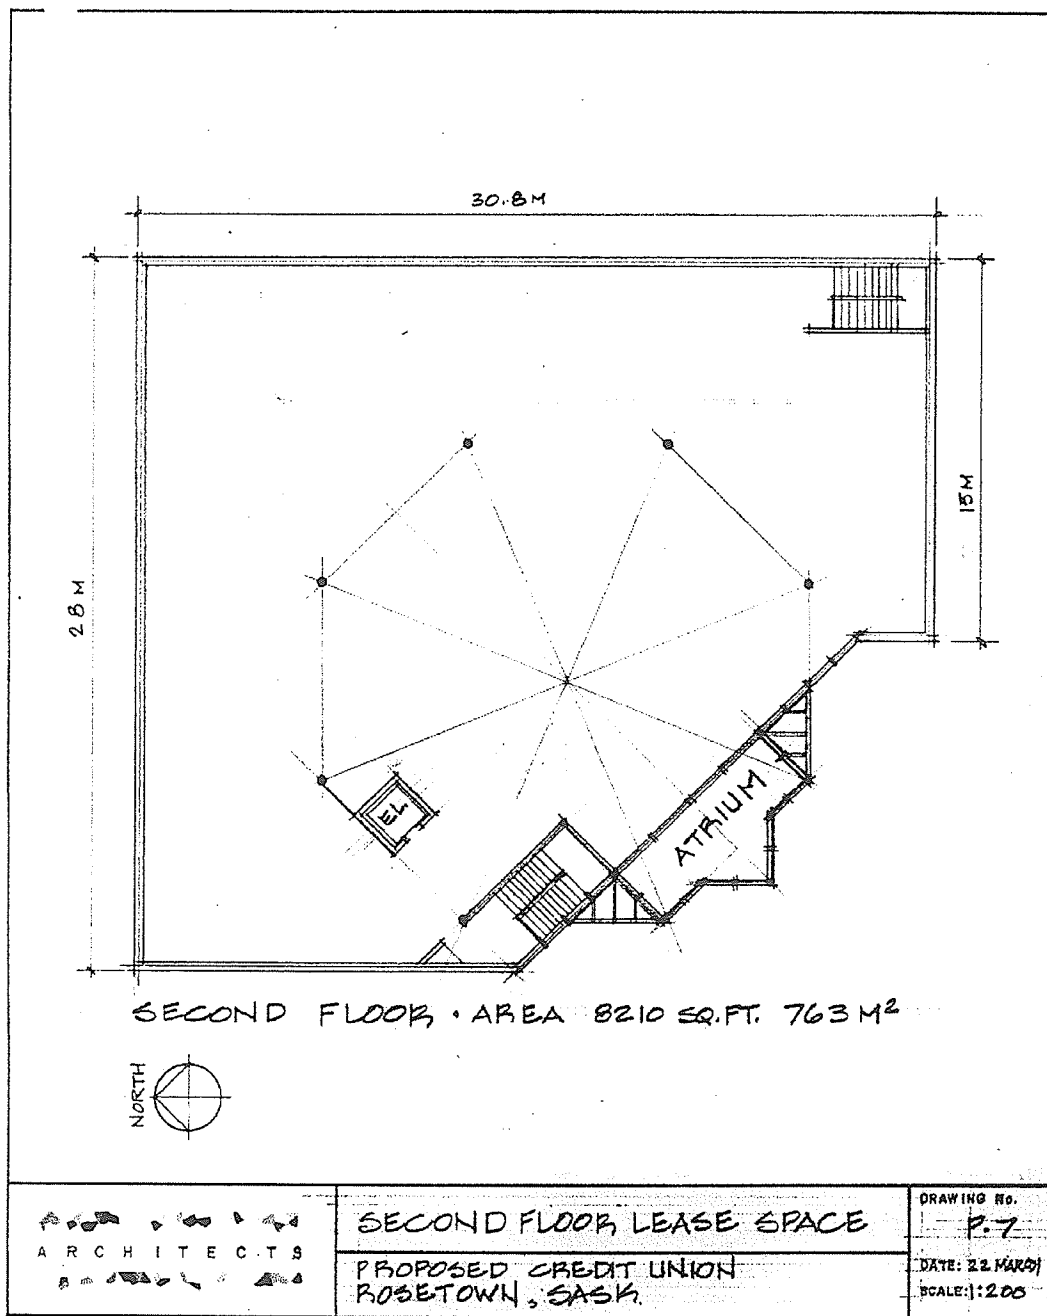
Architect design sketch 7, Second Floor Lease Space. Courtesy of the architect.
